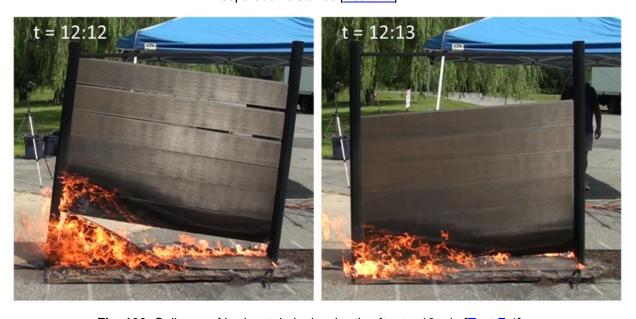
Collapse of horizontal planks shortly after t = 12 min [Test F-1].
